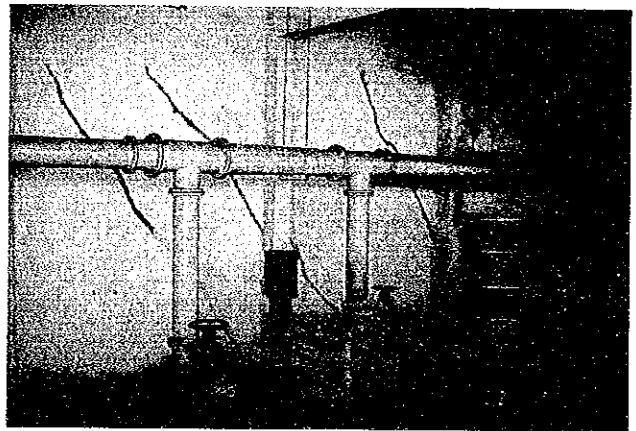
Cracks occurred on non-reinforced brick masonry wall (pump station)
